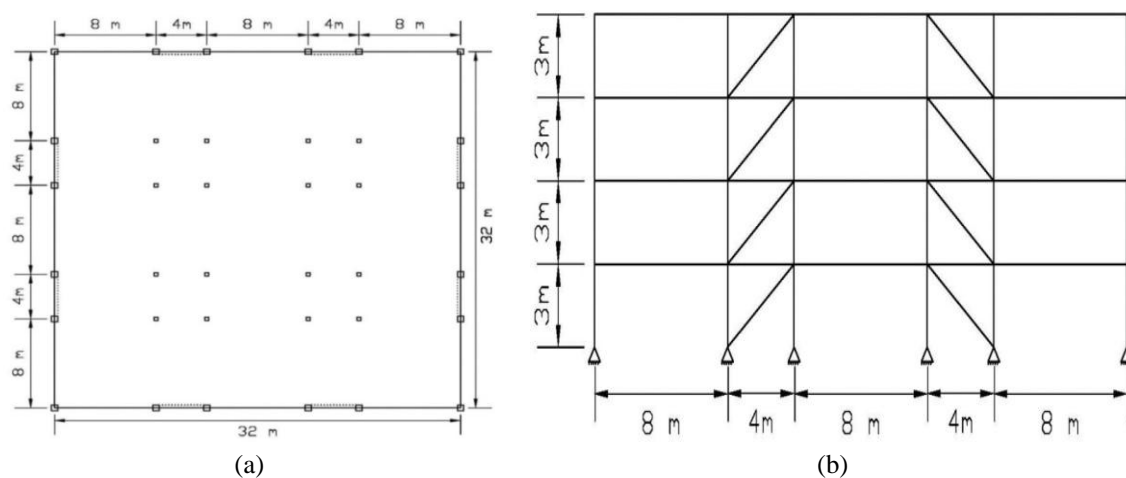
Four storey CBF case study (a) Plan view; (b) Elevation
